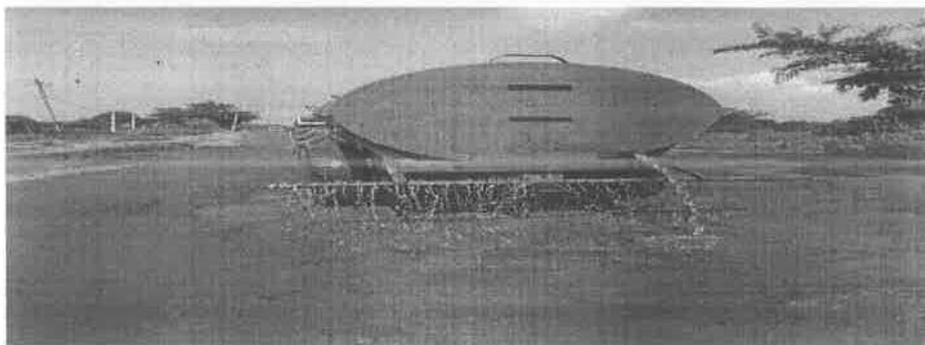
Sprinkling of water on main road Tundri to Kanwali, Saraipali to Odekera & Tundri to Bypass Road Badadarha and ash dyke to L&T gate.
